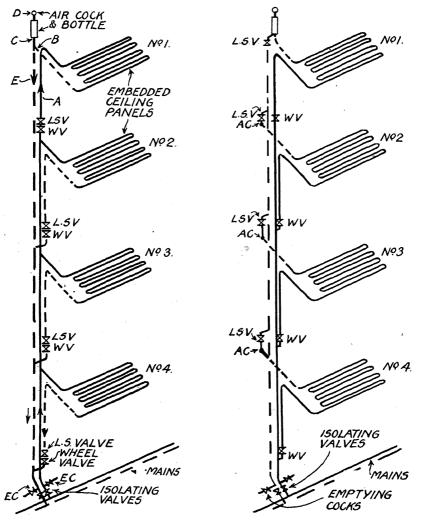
A SMALL SECTION OF AN EMBEDDED PIPE PANEL HEATING SYSTEM
